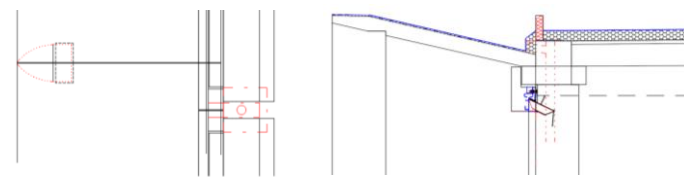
Ogival section pillars and roof colonnade slab details. / Particolare dei pilastri a sezione ogivale e dei solai di copertura del colonnato.
